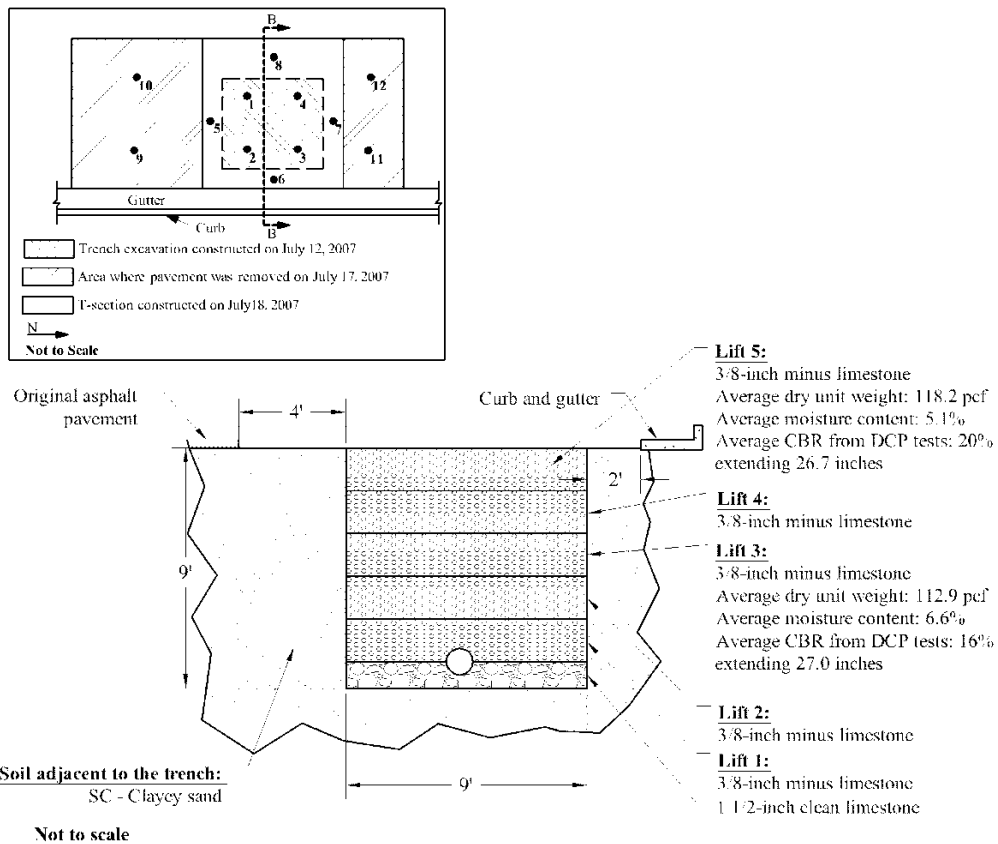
East-west cross-section of Trench B (before construction of the T-section) on July 17, 2007; (a) plan view, (b) cross-section
